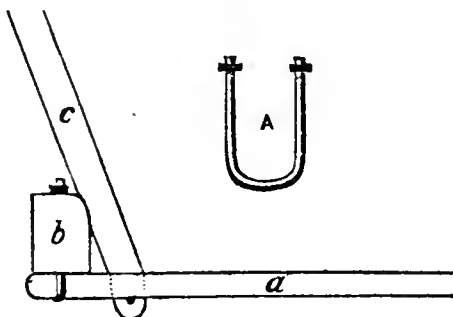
A., Iron for holding Cross-pieces; b., cross-section of side timbers; c., lower portion of Stake; d., Cross-piece.
